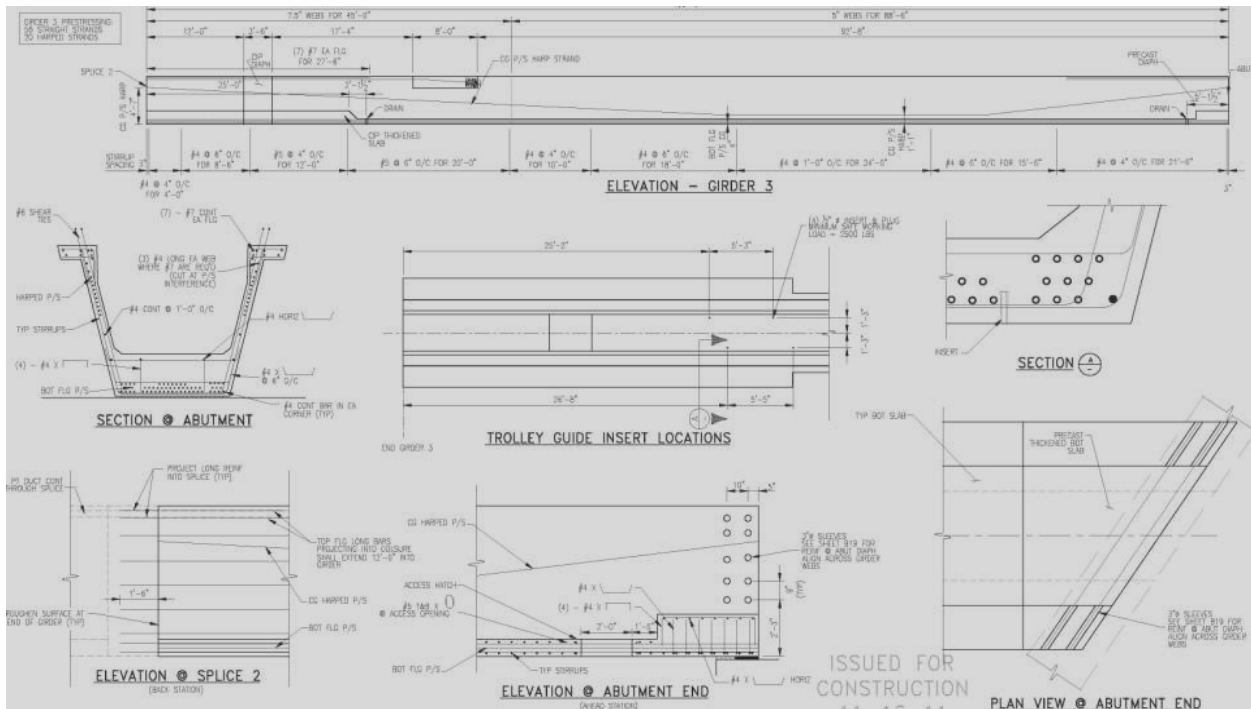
Drawing. U72 girders used on project (courtesy: Colorado DOT).
